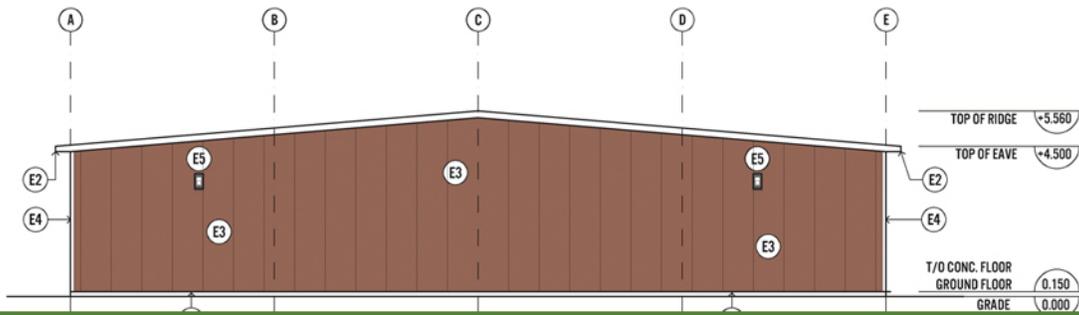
Phase 2 - West Elevation Fronting Wilmott Street
